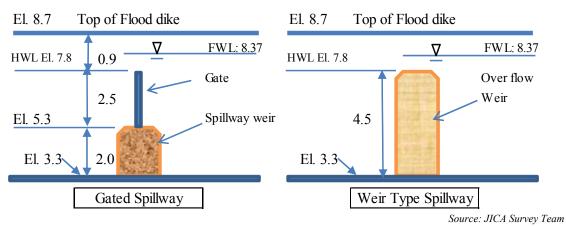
Basic Plan of Kampong Dangkor Spillway
